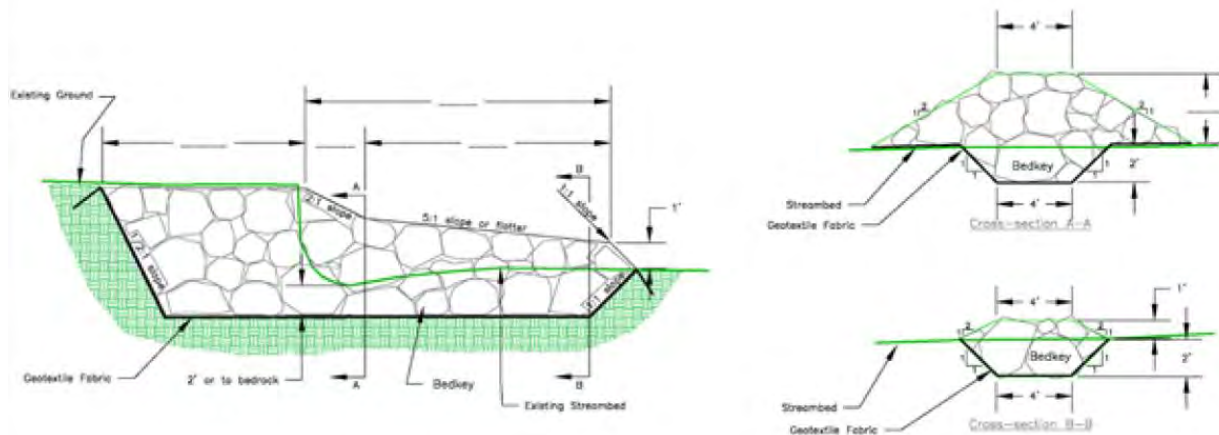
Typical Bendway Weir profile and sections (NEH 2007)
